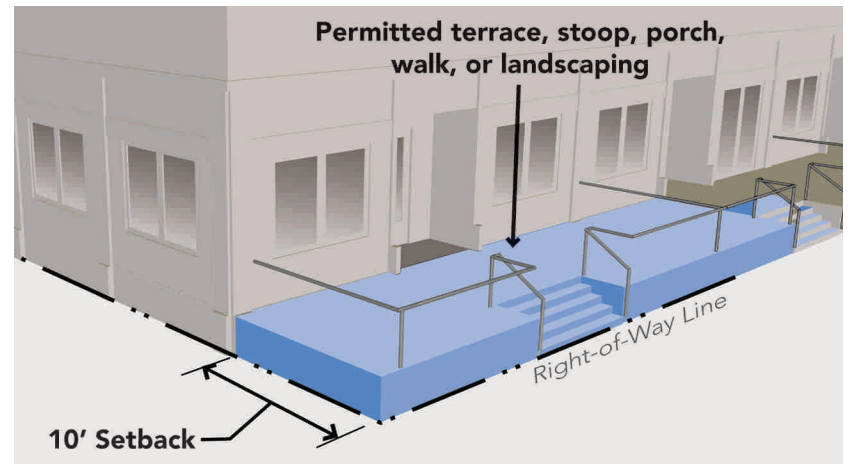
MAXIMUM 10' BUILDING SETBACK AND EXCEPTIONS
